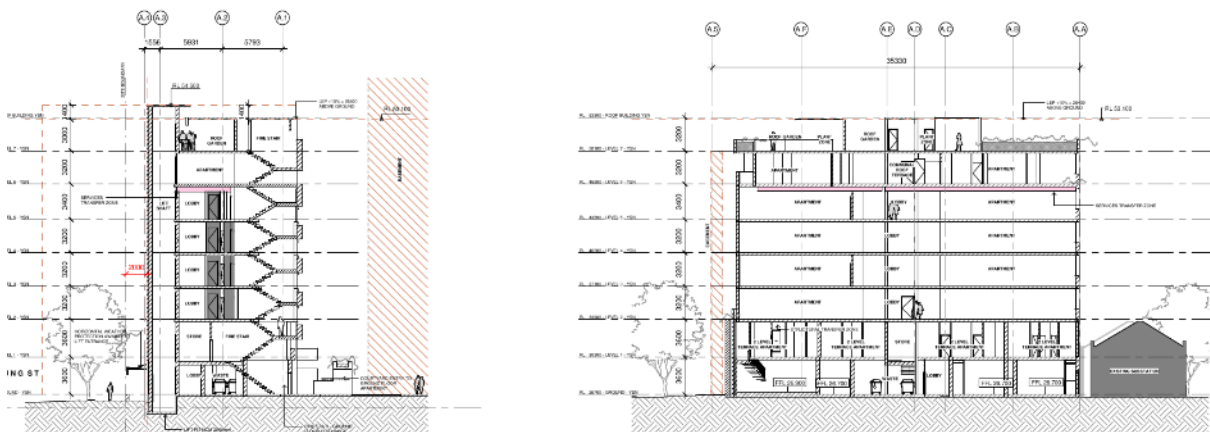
Long and short section plans: Young Street North Building, including communal private open space
